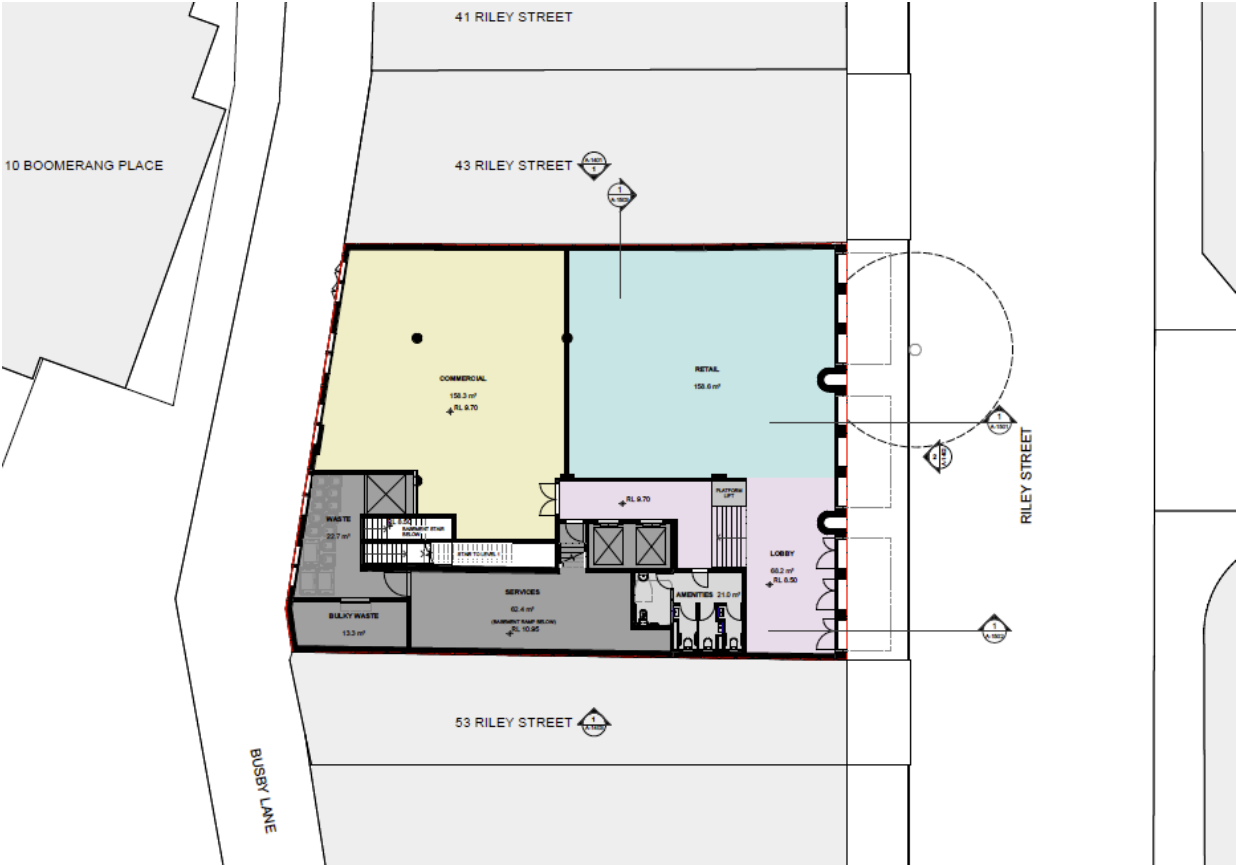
Reference Scheme – Ground floor plan (Source: SJB 2024)
